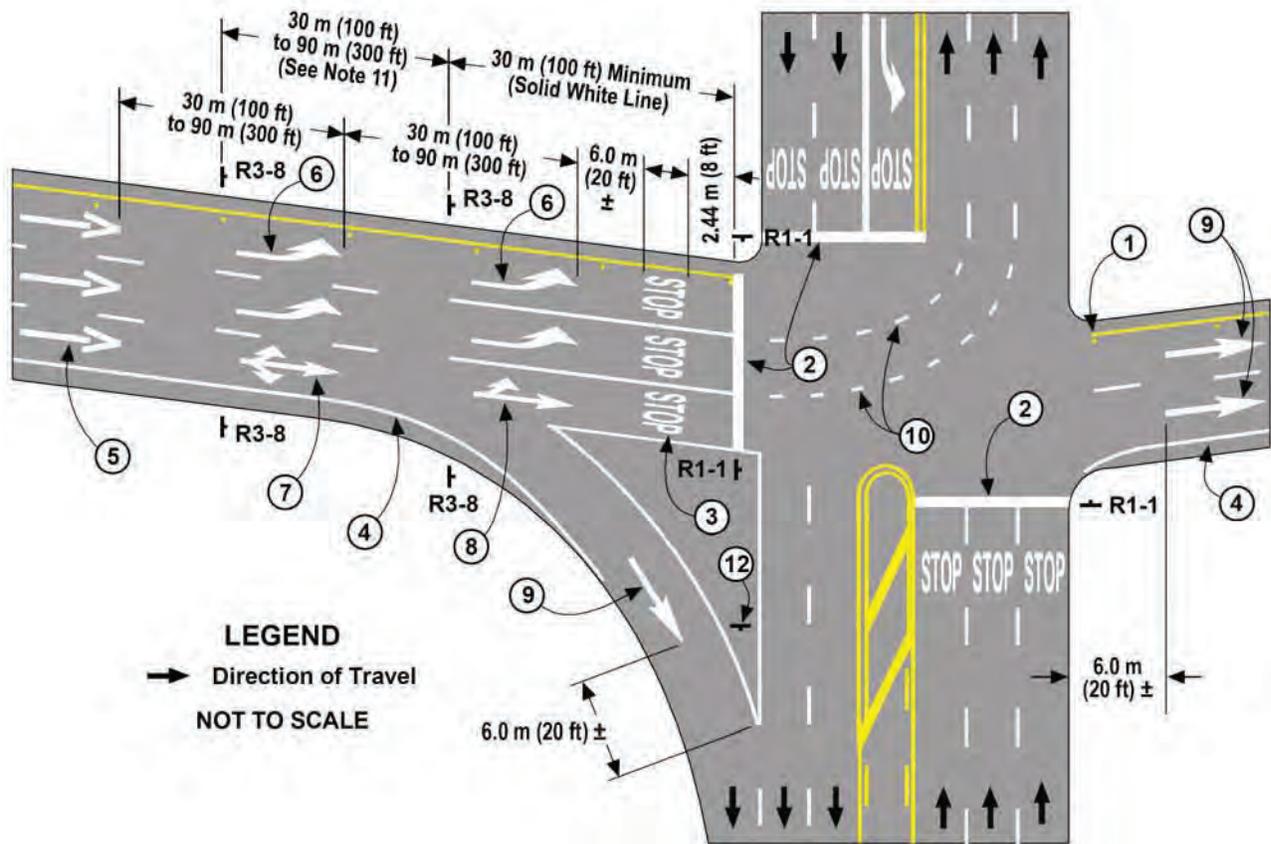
B-23 (CA). Examples of Entrance/Exit Ramp Terminal Signs and Pavement Markings (Sheet 4 of 6)
